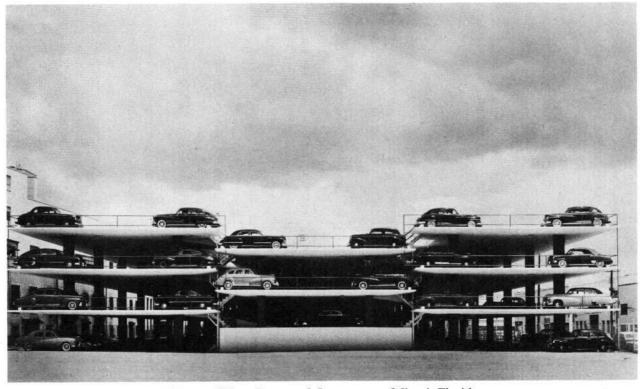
Staggered-floor garage, Miami, Florida.
